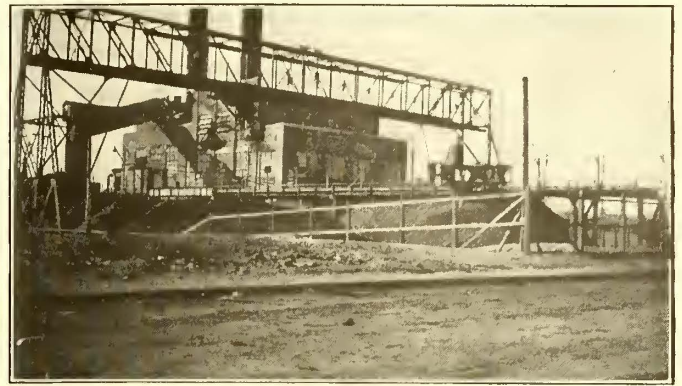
POWER PLANT AND STORAGE AREA FROM HAVEN STREET
